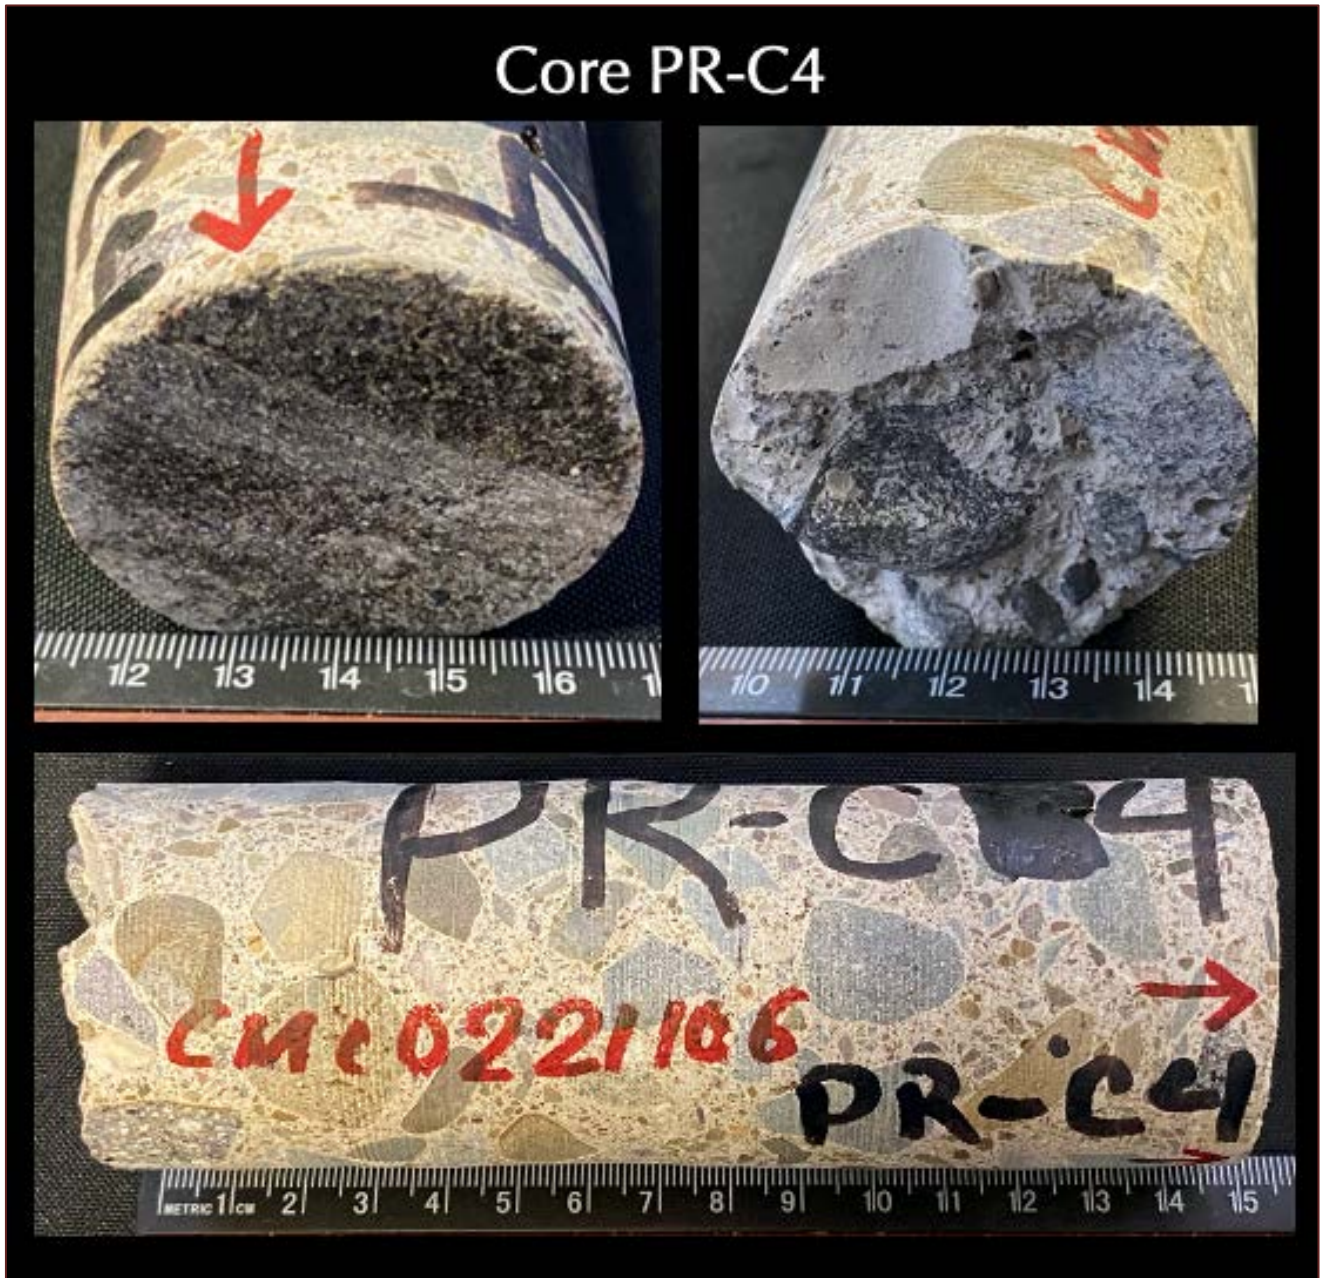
Shown are the exterior weathered grey surface (top left), interior fractured end (top right) and side cylindrical surfaces of the Core PR-C4 from Recirculation Pump Station.
